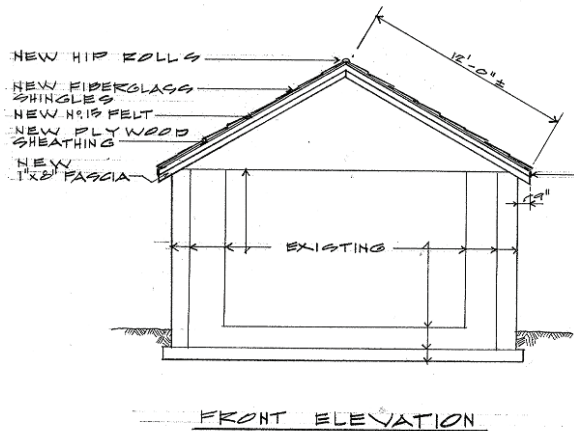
Close-up of front elevation from Boat House "New Roof Plan & Elevations."
